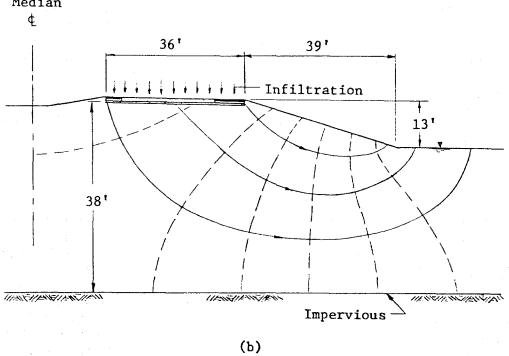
Vertical And Lateral Outflow Through Embankment And Its Foundation
